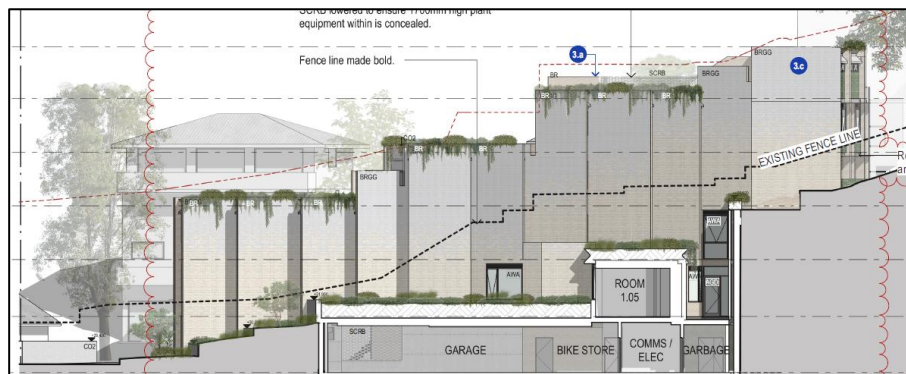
Proposed eastern elevation (Source: TonkinZulaikhaGreer)
